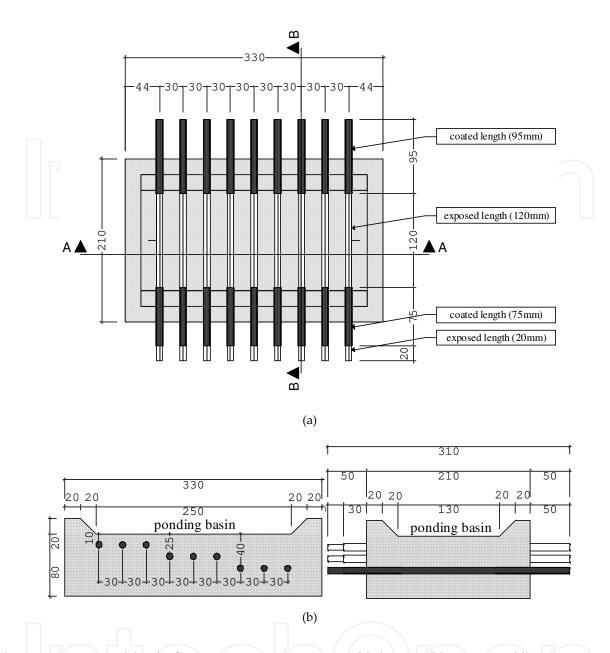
Constructional details of corrosion monitoring specimens, (a) Plan view, (b) Section A/A (c) Section B/B.
